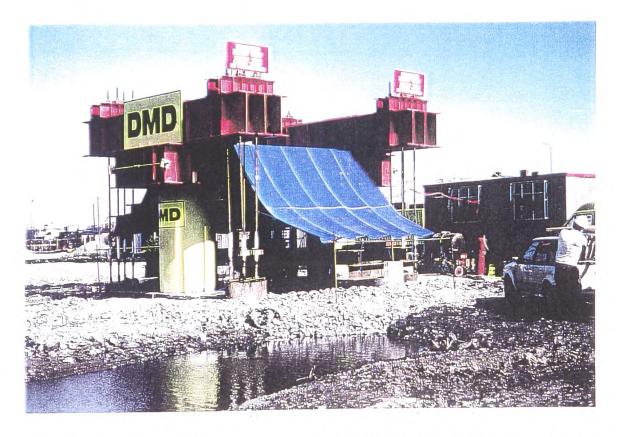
A 2000 ton test loading rig developed by DMD Piling Ltd (Cardiff) utilising 4 anchor piles
